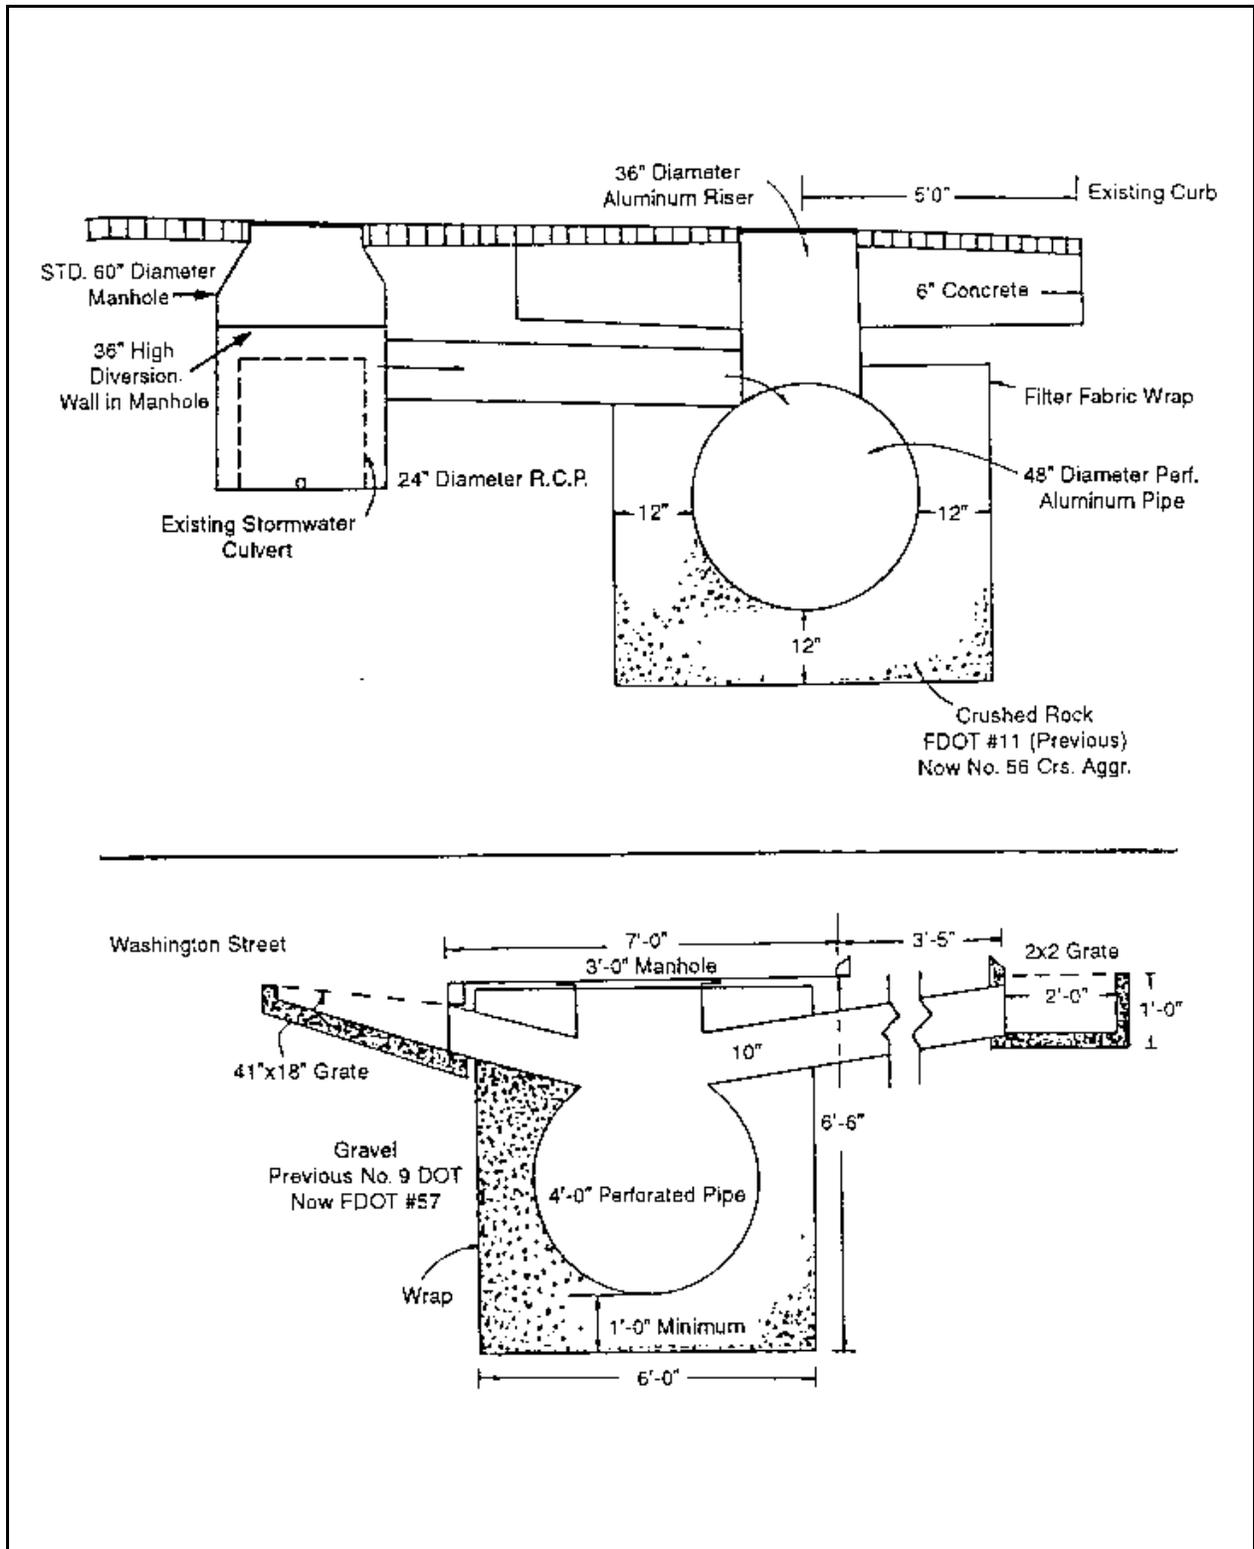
Examples of Typical Underground Percolation Systems for Retrofitting Existing Stormsewer Systems in Orlando, Florida.
